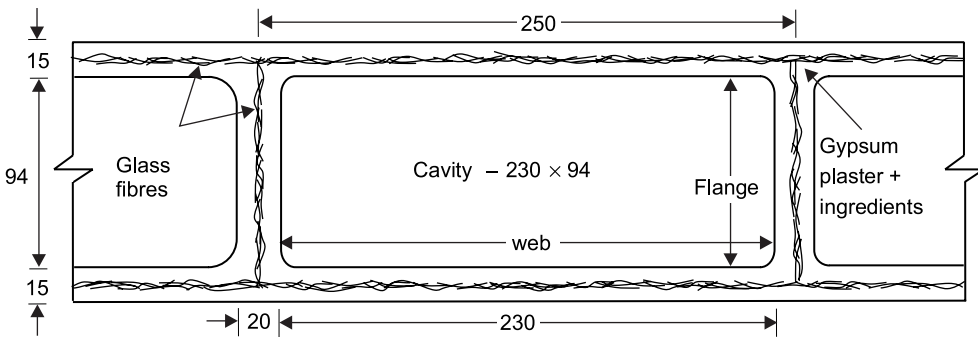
Typical cross section of a GFRG panel (all dimensions in mm)
